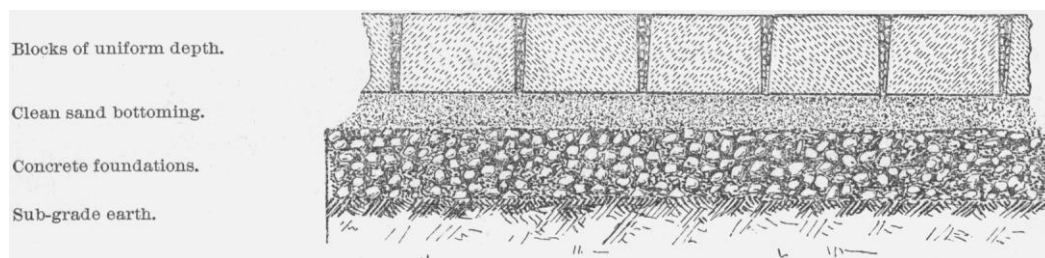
PAVEMENT AS CONTRACTED FOR.
